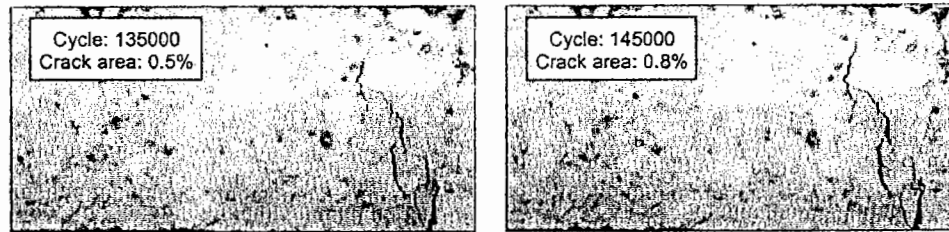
Example of tensile cracks on bottom tensile face of beam specimen between central loading clamps [9]
